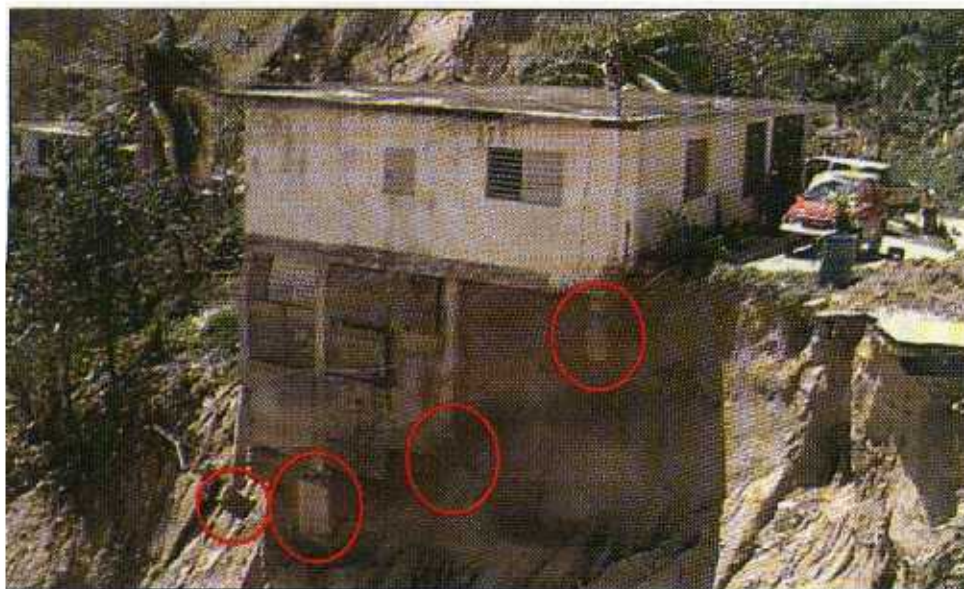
Concrete residential structure with foundation damage caused by a landslide. Note unstable footings (circled).
